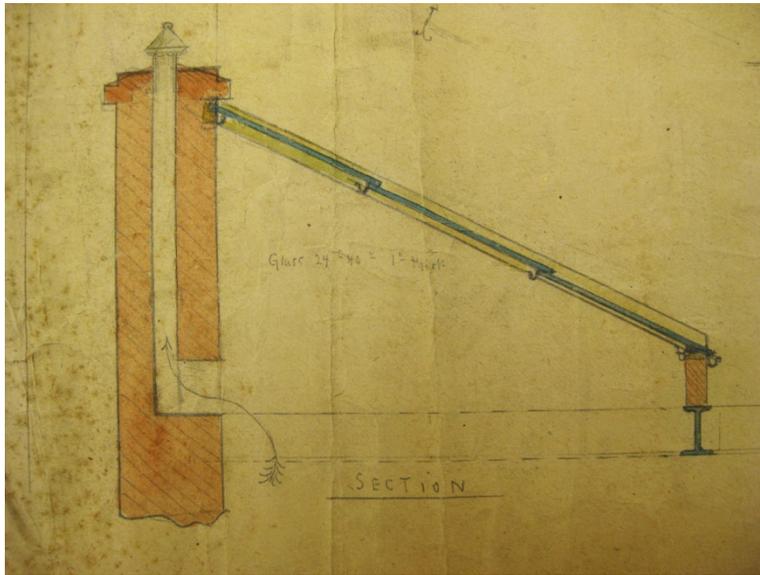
“Solar chimney” at Galveston Daily News Building (left)
